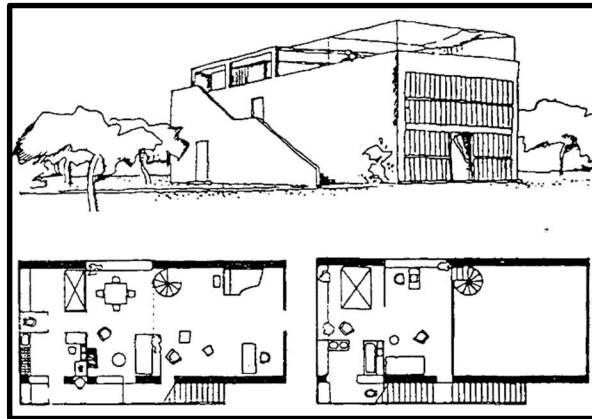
Perspective view and floor plans of the Citrohan House [4].
